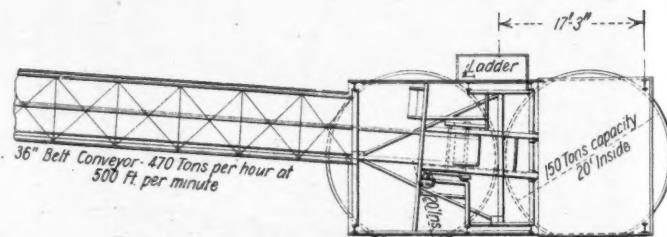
PLAN OF MAIN TIPPLE, SLACK BINS AND HOIST HOUSE
